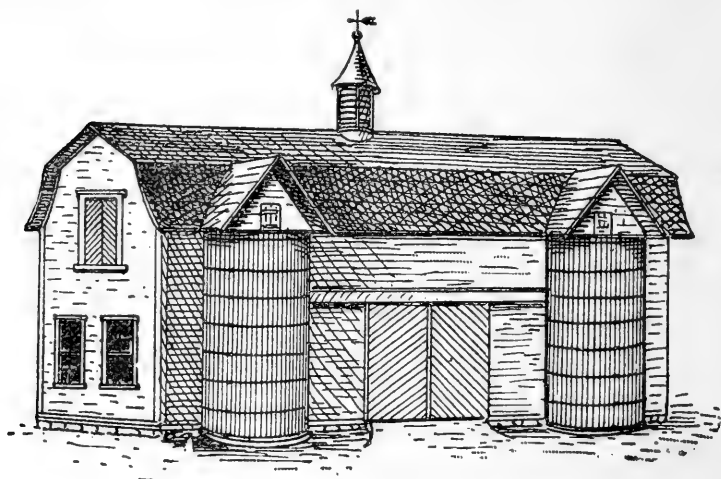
TWIN STAVE SILOS BUILT IN CONNECTION WITH BARN. (ELIAS.)
